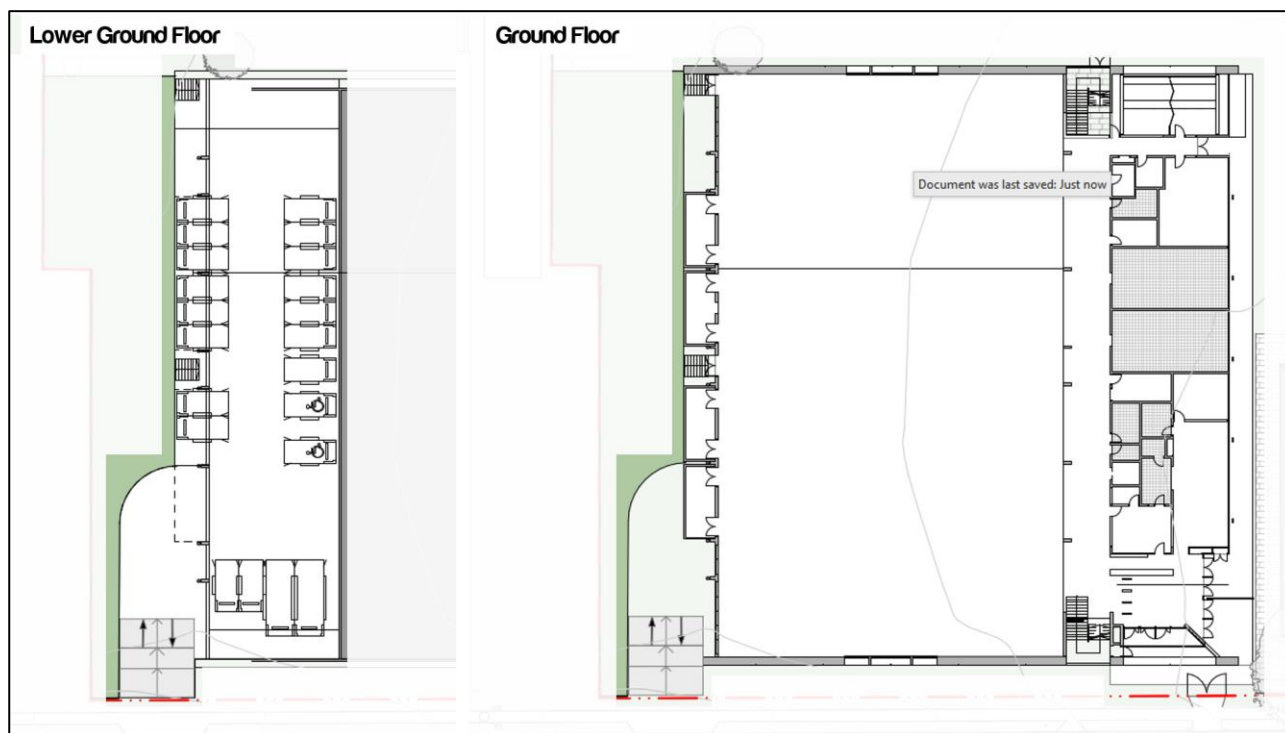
PCYC Facility (Approved Driveway and Basement Carpark Plan)
